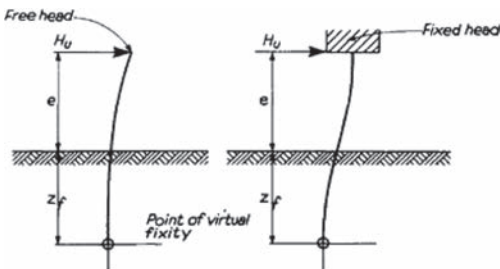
Piles under horizontal loads are considered as simple cantilevers.
